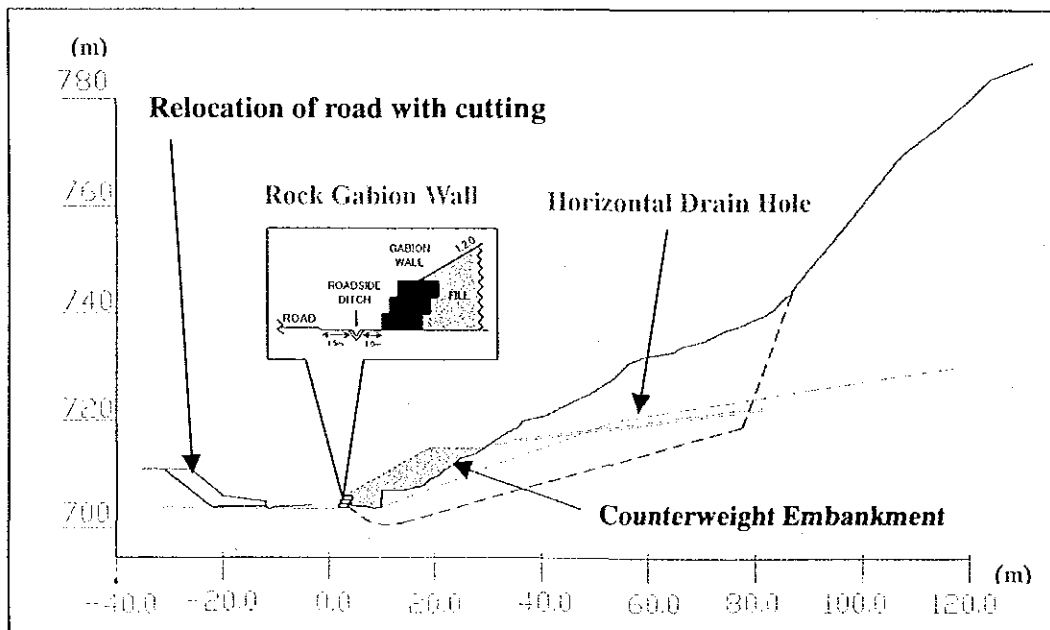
Cross section of counterweight embankment at CH 81.30 km.
